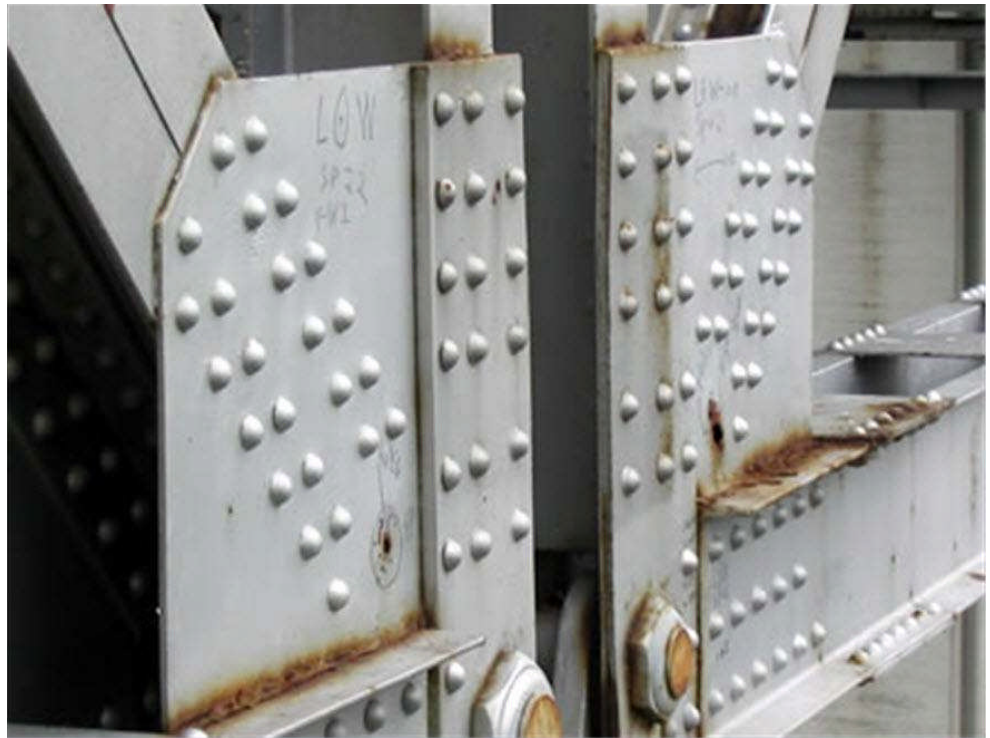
General Corrosion of Gusset Plates
